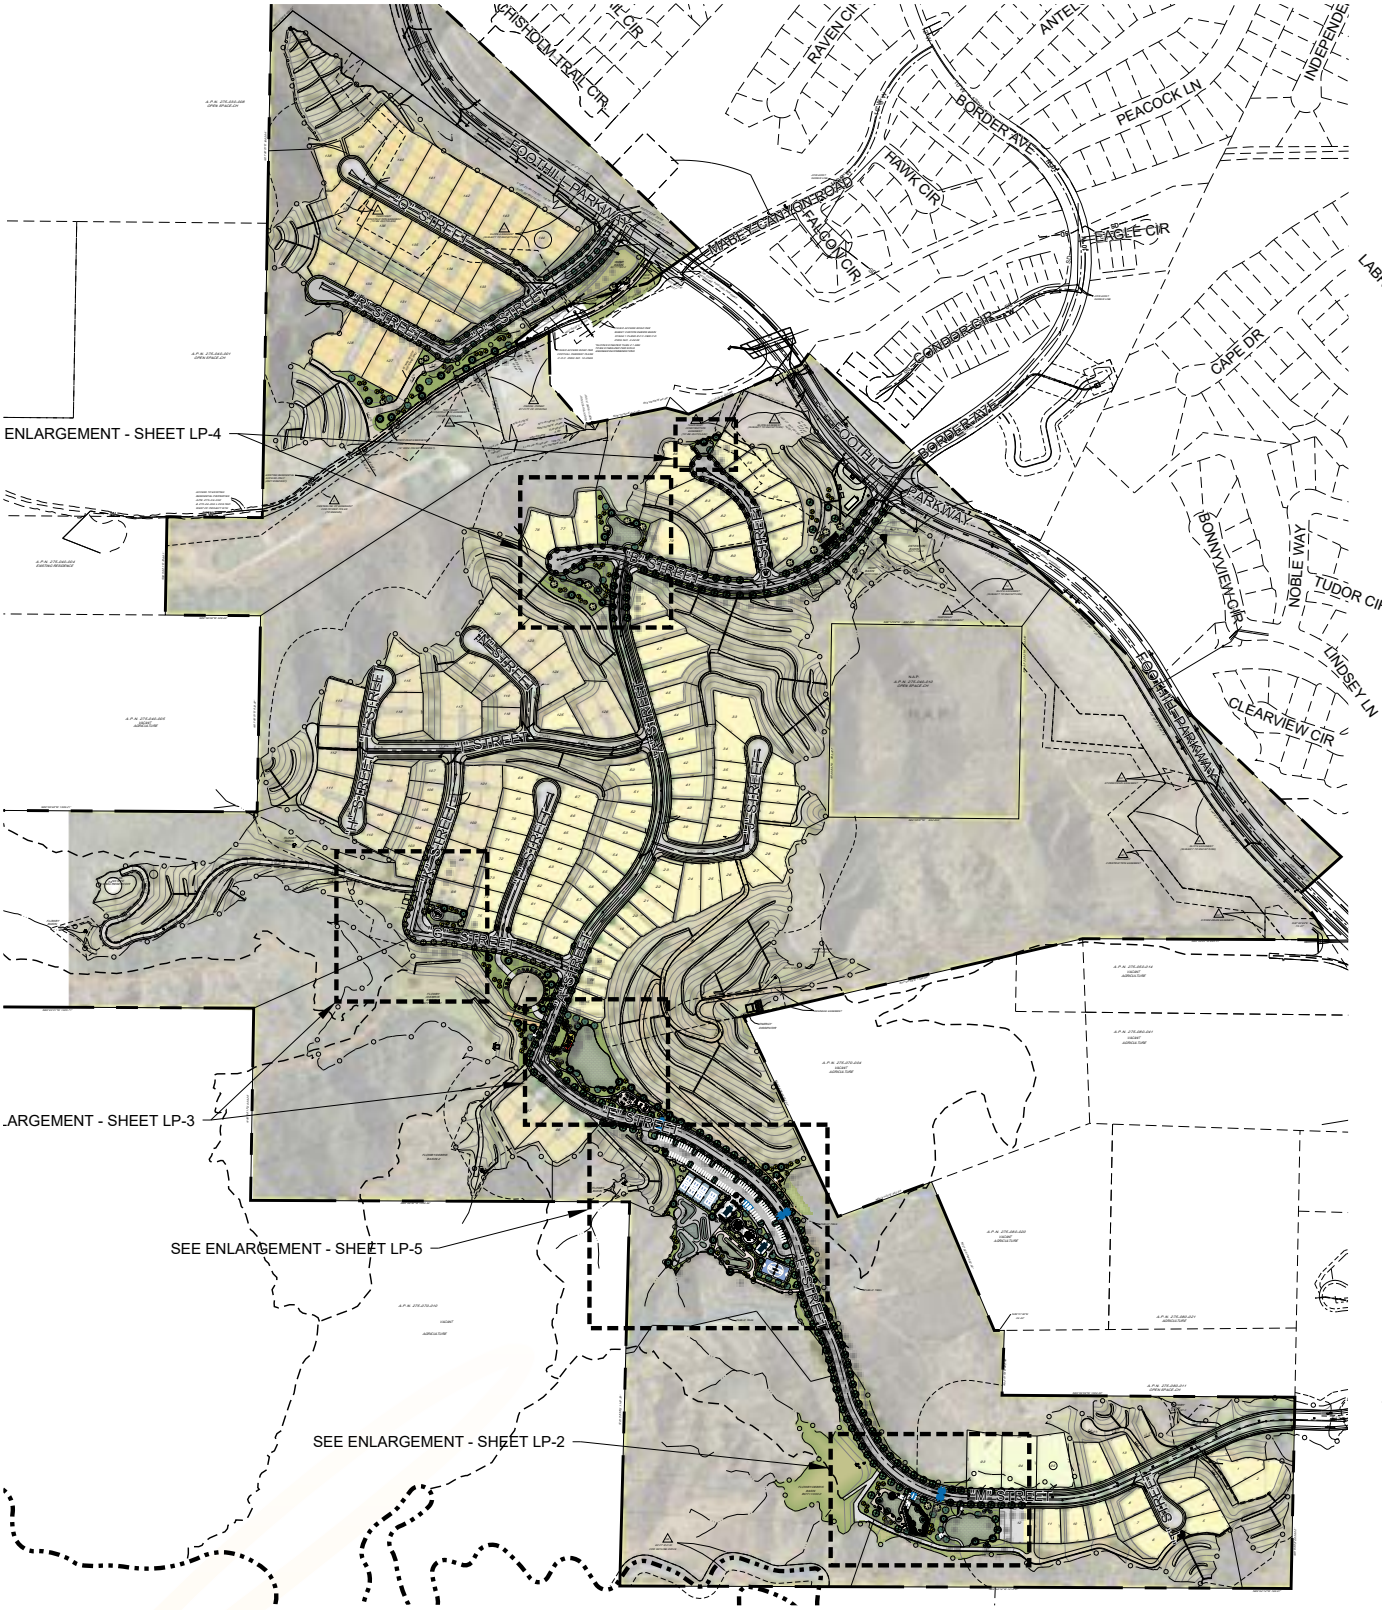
LANDSCAPE MASTER PLAN
